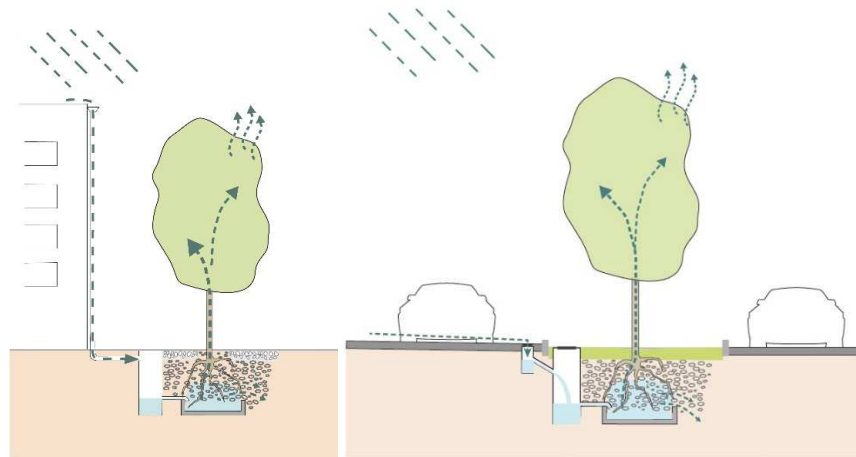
Stormwater tree pits in Hamburg-Harburg (left) and Hamburg-Bergedorf (right) with underground storage elements and drainage from roofs and streets (© HCU, BGS).
